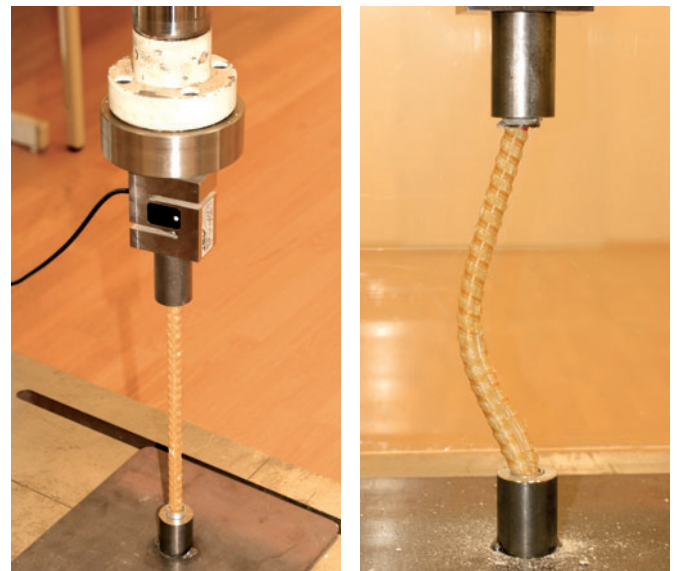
GRP spacer clamped in the test press. a) before being loaded and b) during the application of pressure. In b) the rod exhibits strong bending, which led to the interlaminar shear failure of the glass fibres.
